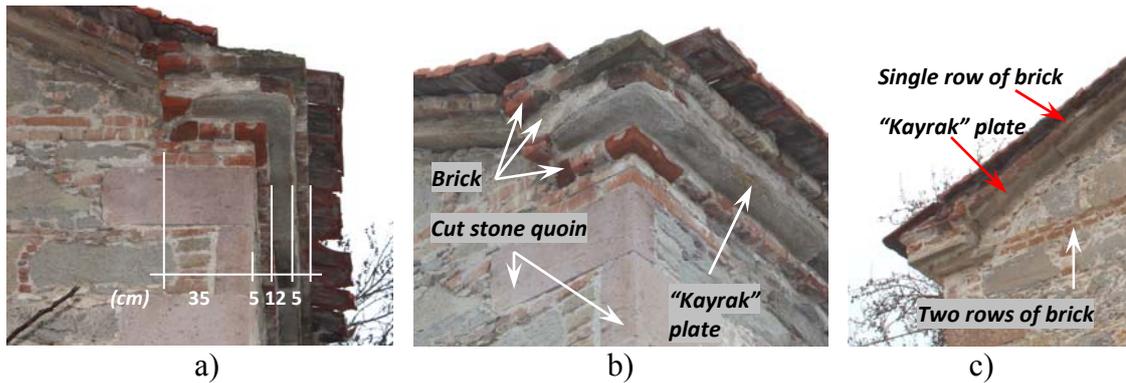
a) A view of the eave and the quoin (eastern corner of the south façade), b) a diagonal view of eave and placement of cut stones in the quoin, c) brick courses embedded in the eastern wall
